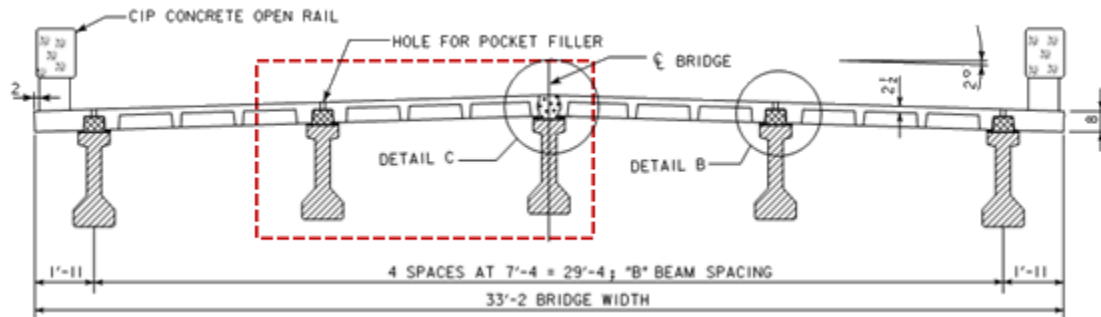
Cross-section details of the proposed UHPC waffle deck bridge in Wapello County
